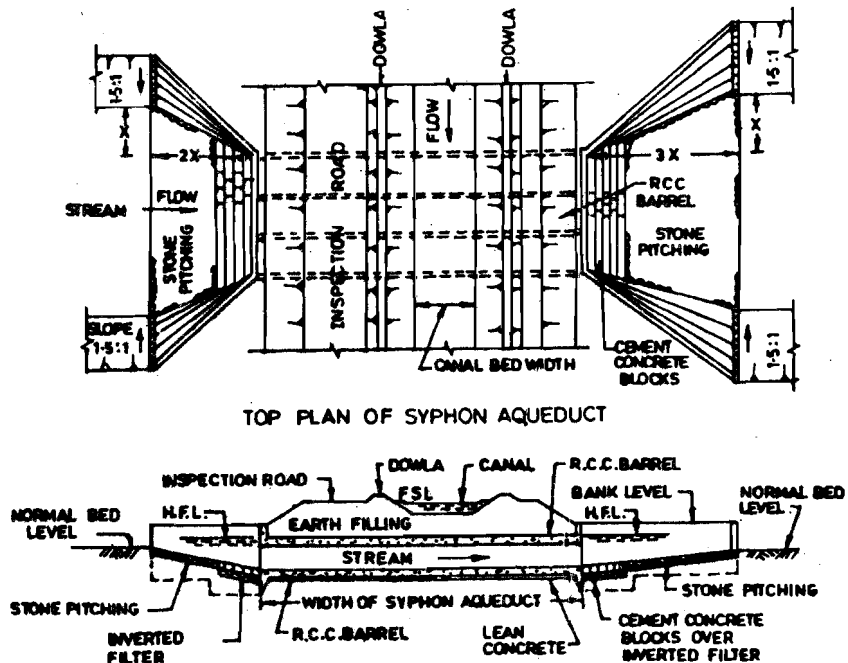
Typical Plan and Section of Syphon Aqueduct (Type I)
